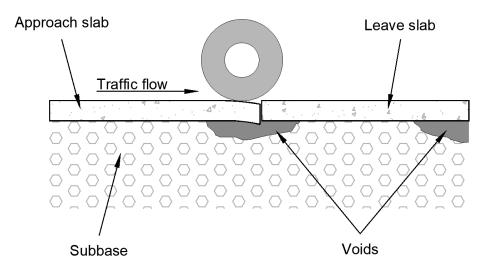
Voiding caused by water penetration into the subbase through joints resulting in localised inadequate slab support.
